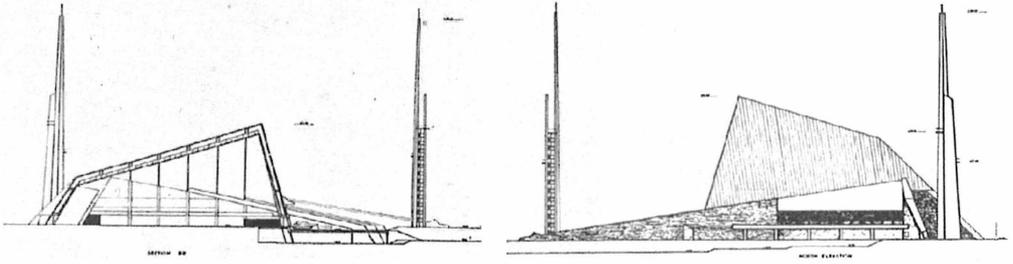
Section and elevation of Bindal's design for King Faisal Mosque, 1969. (Source: "Uluslararası," 1969. Used with permission.)
